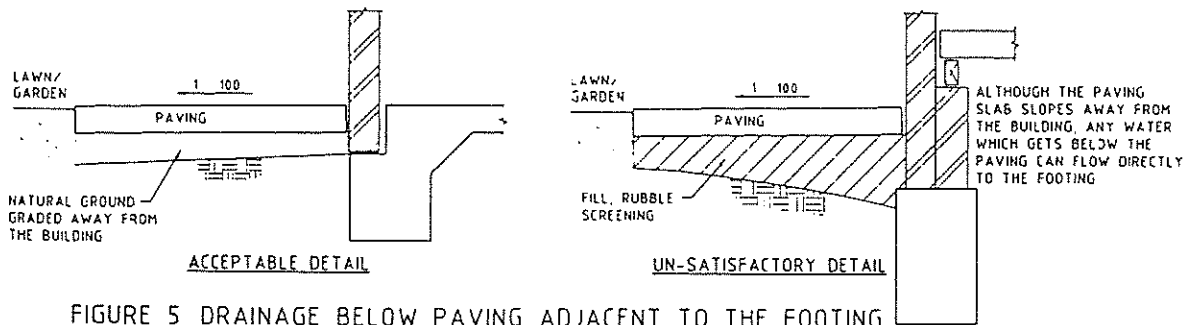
DRAINAGE BELOW PAVING ADJACENT TO THE FOOTING
